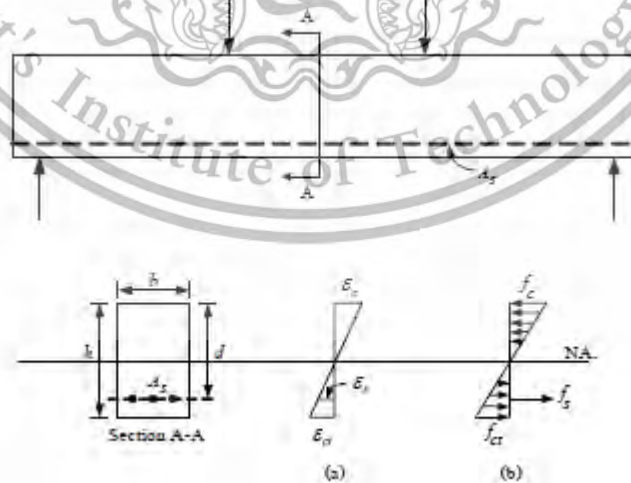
Rectangular cross-section beam under load in linear elastic range [10]
